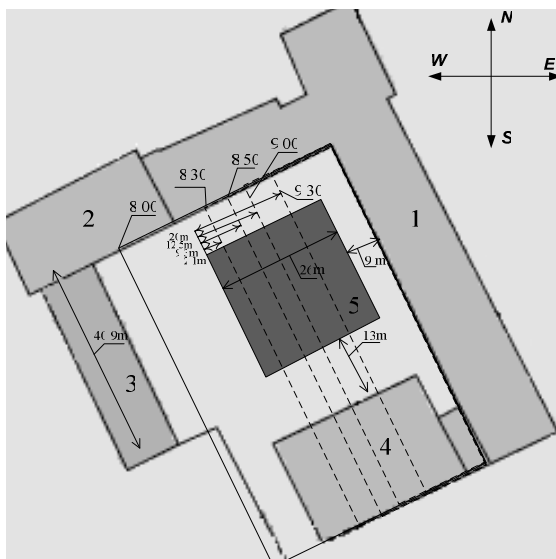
Shadow measurement on March 23 (in the morning): 1 – old building, 2 – new building, 3 – garages, 4 – workrooms, 5 – green area
